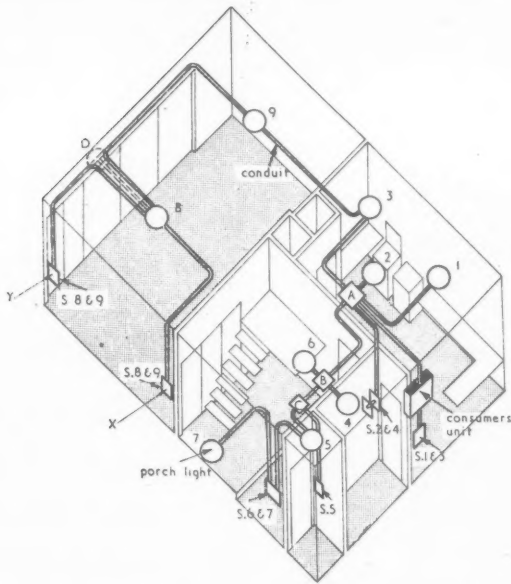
(above), axonometric drawing showing conduit for ground floor lighting points. Fig. 10 (below), circuit for two-way switching applicable to conduit.
